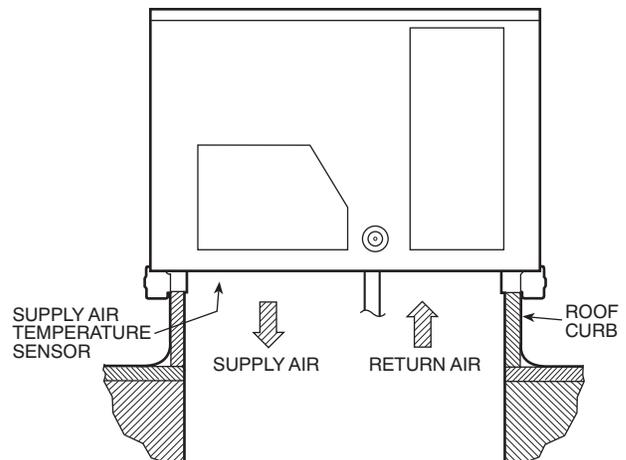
Typical Mounting Location for Supply Air Temperature (SAT) Sensor on Small Rooftop Units
